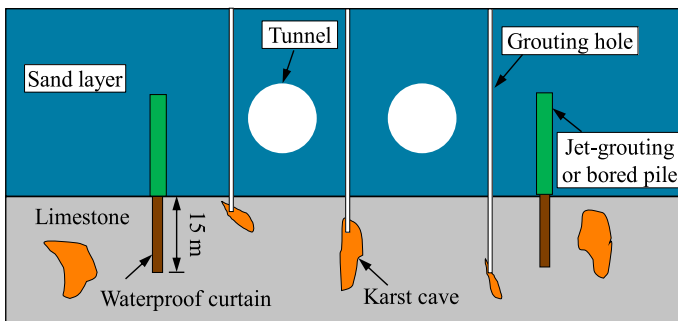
Illustration of a grouting curtain for cutting off water (after He et al. 2017)
